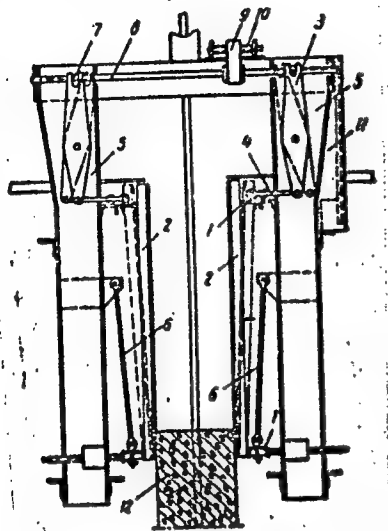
1--movable bow members; 2--form panels; 3--dual levers; 4--braces; 5--jack frame; 6--hangers; 7--nuts; 8--horizontal shaft; 9--stop; 10--regulating screw; 11--drive; 12--wall
